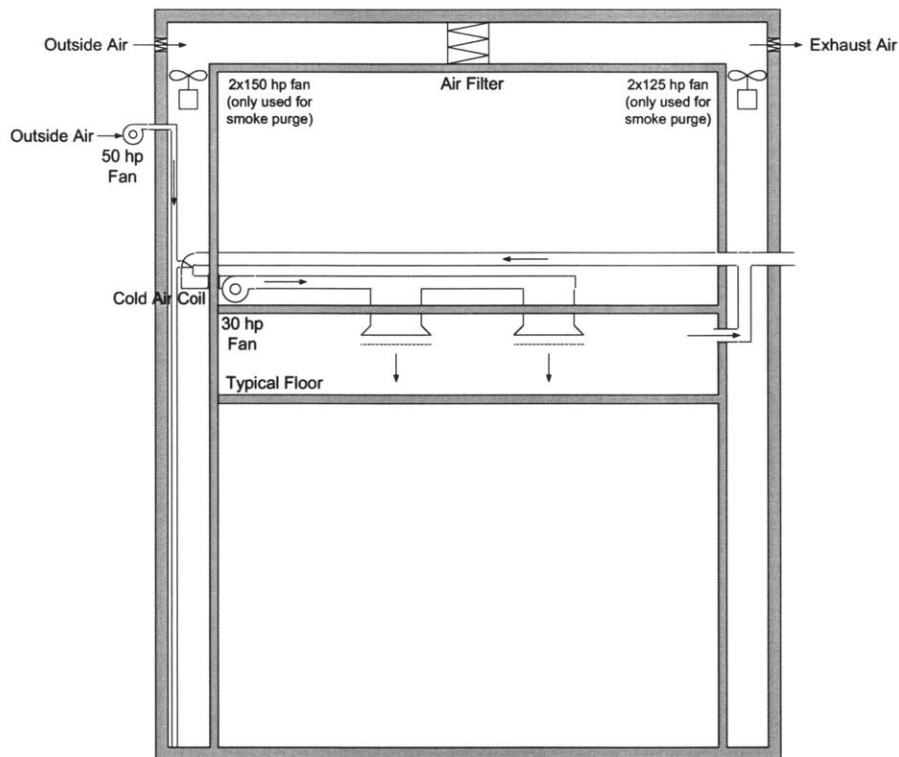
Extremely Inefficient Ventilation System in Building Z (Side View of Building)
